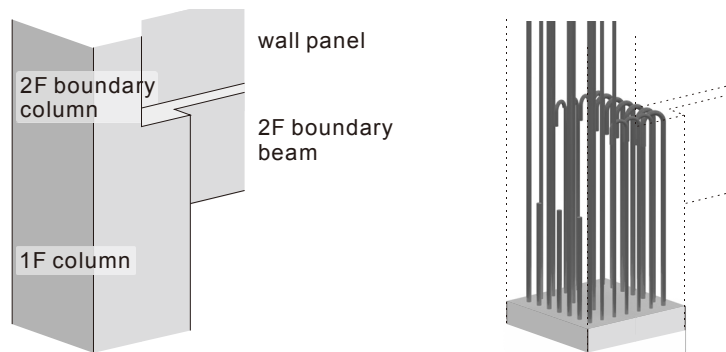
Detail of column longitudinal reinforcement inside beam-column joint
